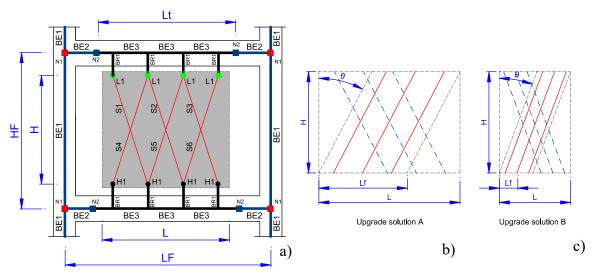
Configuration of the MSM03-BC strip model placed into a one floor — one bay RC typical frame (a) and general configuration of strip models corresponding to the upgrading solutions A (b) and B (c).
